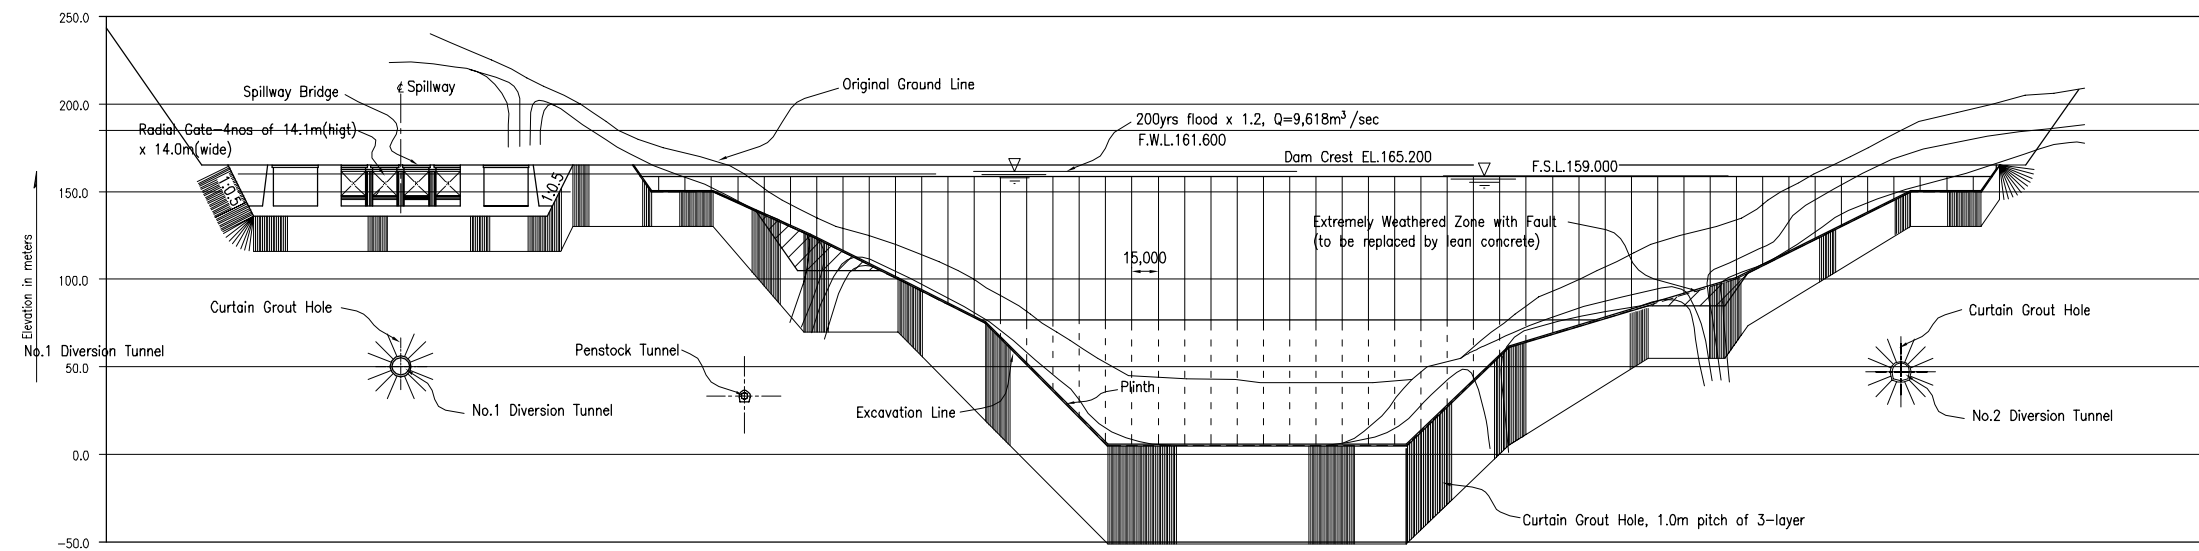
Typical Cross Section and Profile of Agos Dam
